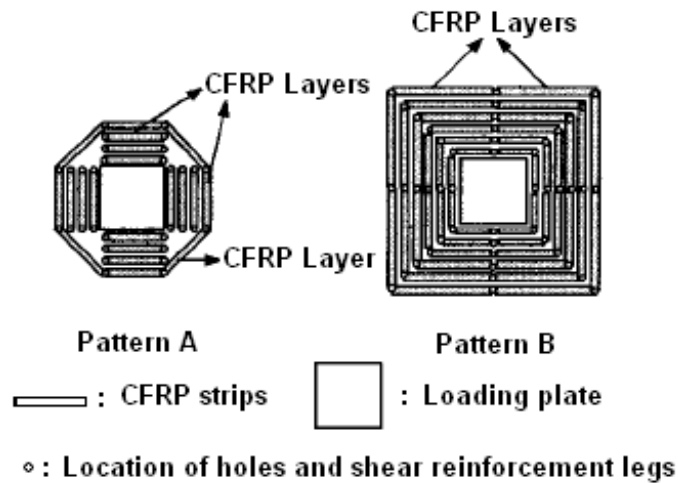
Strengthening pattern and details (plan view); Ref. [15].
